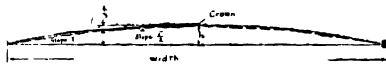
A.—Besson's Improved Section for Cambered Roads.
